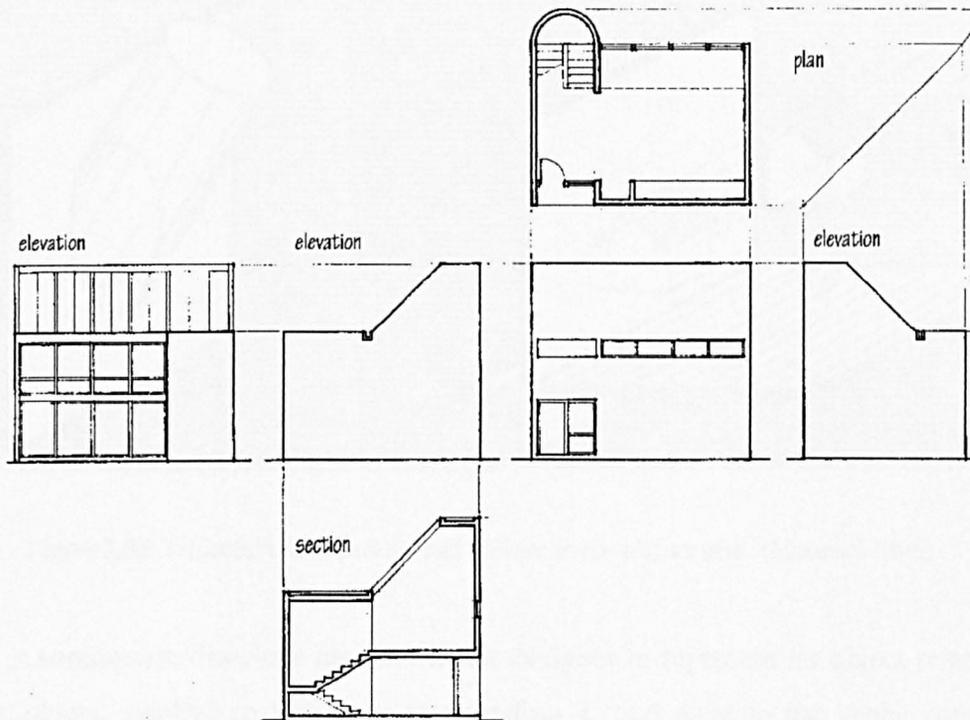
Plan, section and elevation as combined views (Ching 1996)
